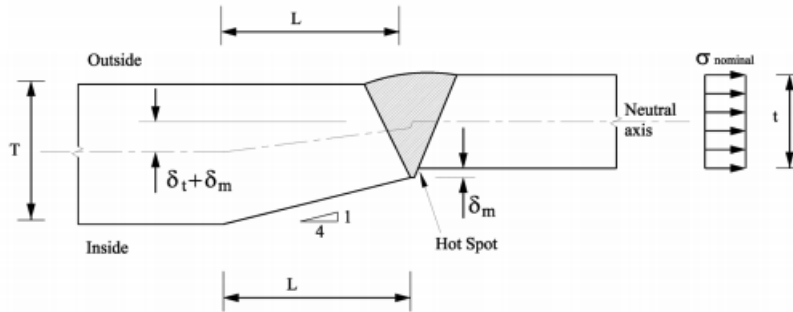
Detail of geometry for weld in tubular from the outside from DNV-RP-C203
